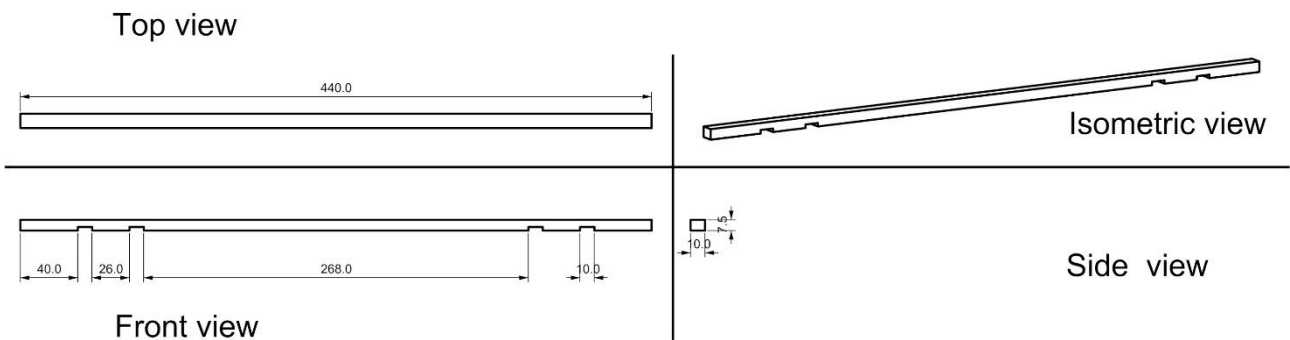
Roof rafter beam Orthogonal projections in cm
